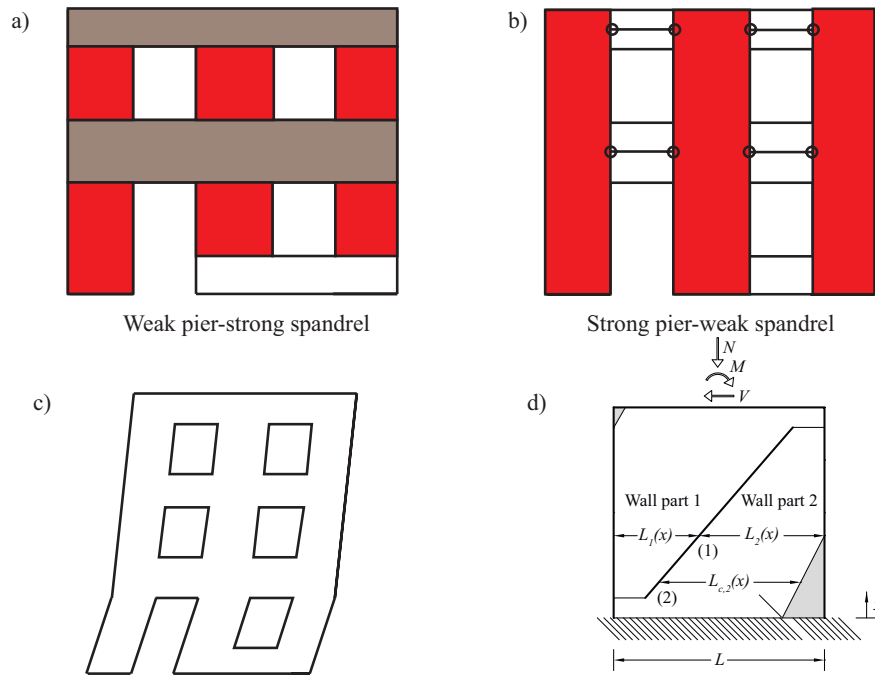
Simplified structural schemes for masonry buildings: a) weak pier-strong spandrel assumption; b) strong pier-weak spandrel assumption; c) base story failure as postulated in Lestuzzi. d) Scheme of the analytical model proposed by Wilding and Beyer (2017) (adapted from Wilding and Beyer (2017))
